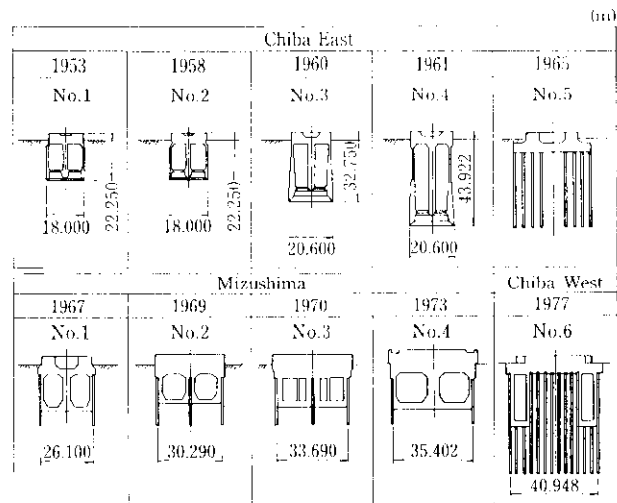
Development of blast furnace foundation at Kawasaki Steel
